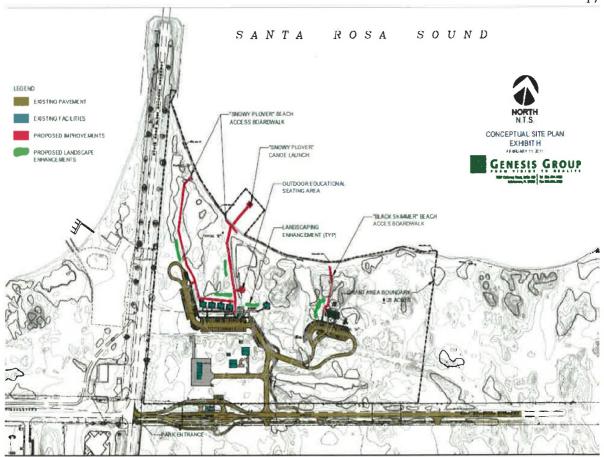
Figure D. Conceptual plan for the proposed Navarre Beach Park Coastal Access and Dune Restoration Project
